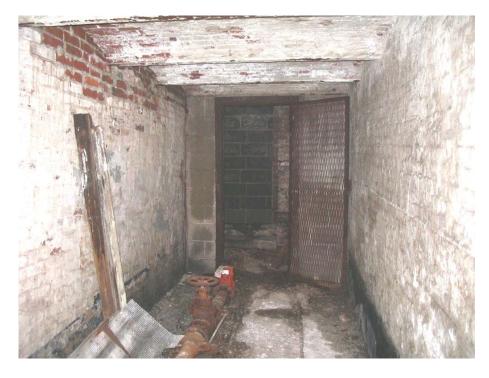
West portal at basement of Building 44, Old Storeroom; Note blocked stairwell to Building 44
